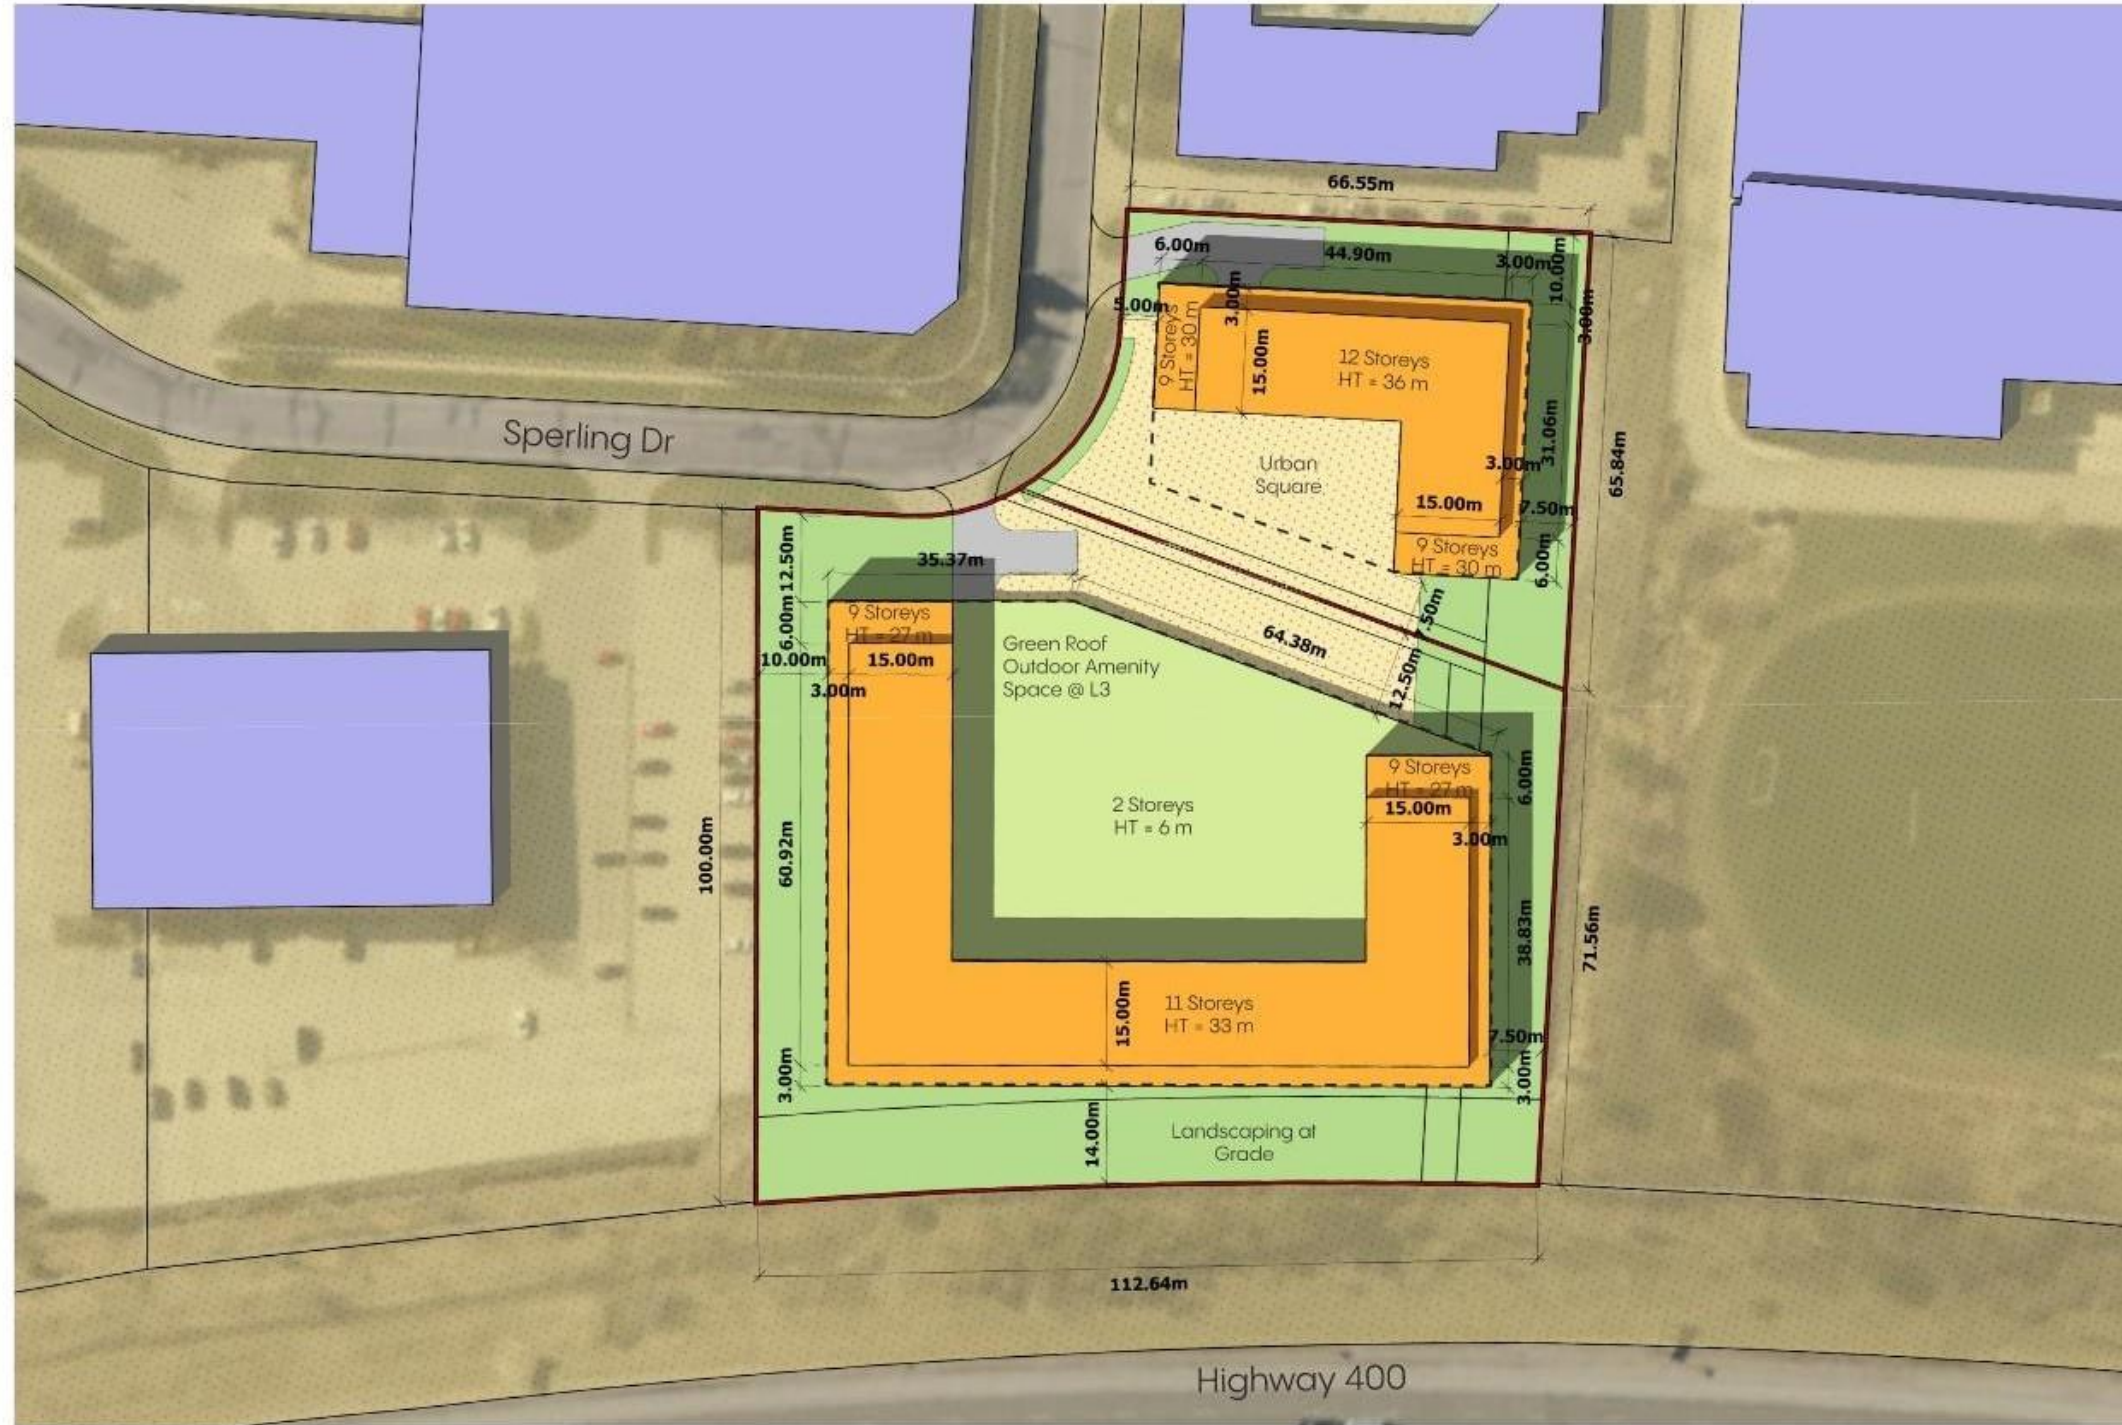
Plan View ◀ N ■ Residential ■ Non-Residential ■ Outdoor Amenity Space ■ Landscaping at Grade Outline of Underground Parking
